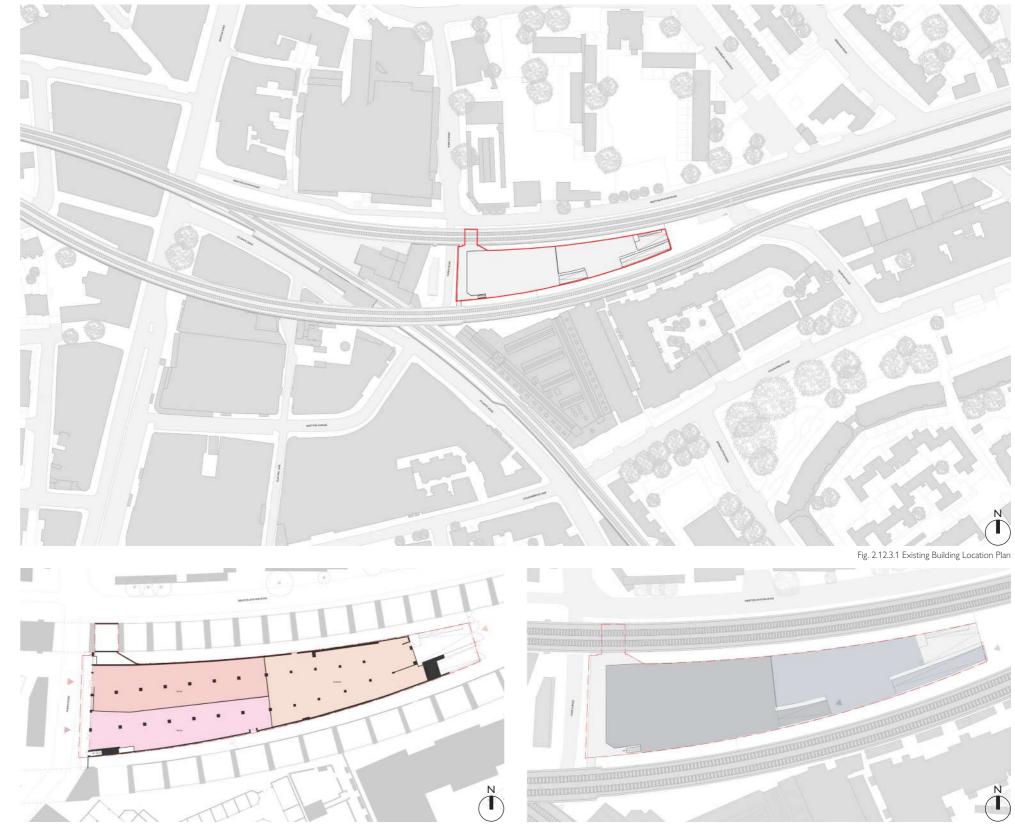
Existing Building Ground Floor Plan - Uses
